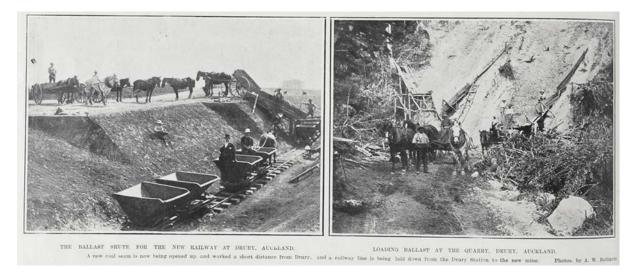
Transporting ballast material to construct the new railway line, 1905.
